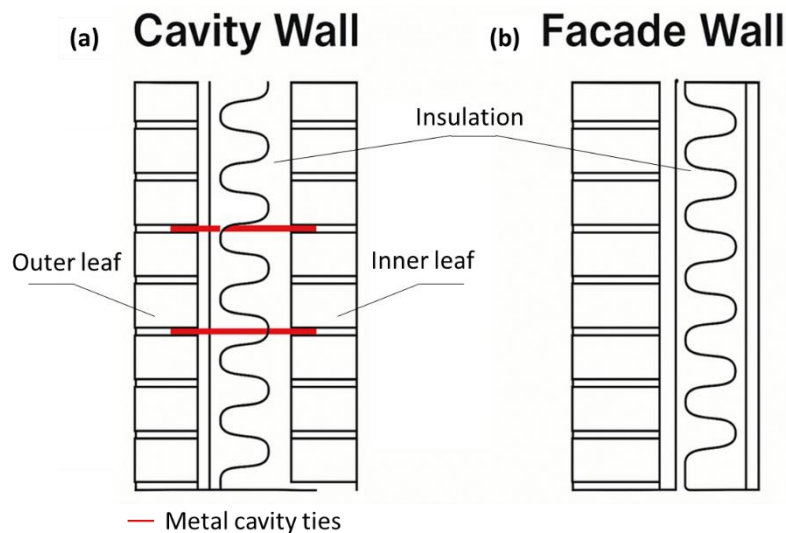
Schematic example of masonry cavity wall (a) and masonry façade (b).
